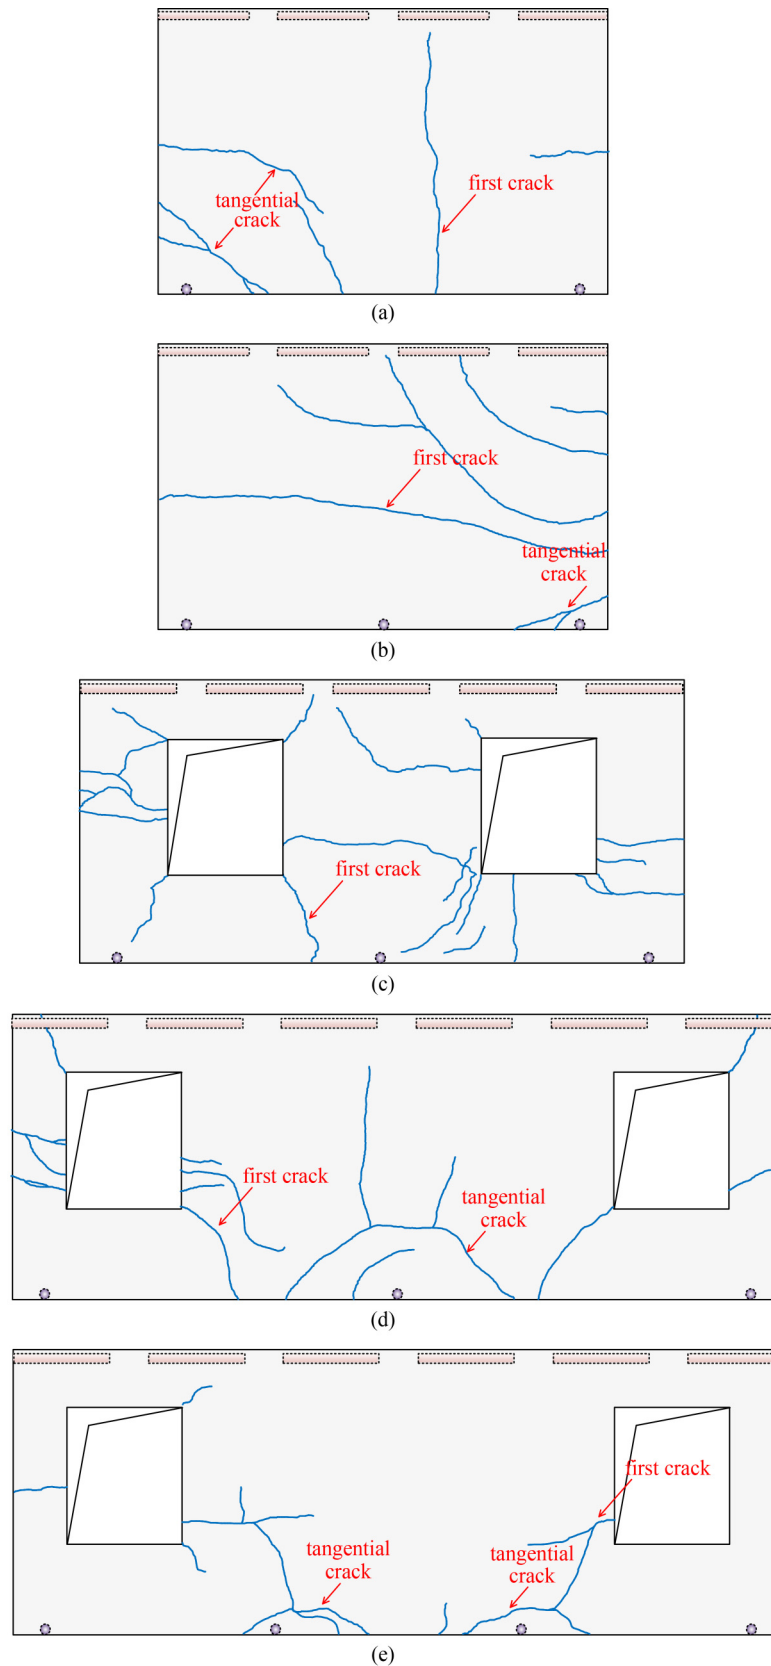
Crack pattern of the test specimens: (a) SP-4980-0-2; (b) SP-4980-0-3; (c) SP-6280-2-3; (d) SP-8020-2-3; (e) SP-8020-2-4.
